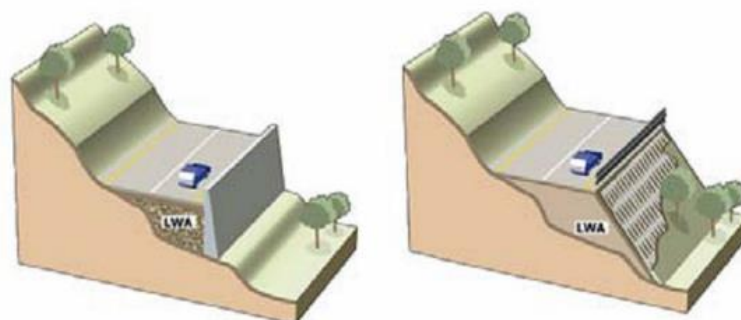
A Schematic Plan of Application of LECA on Lightweight Embankment on Slopes [13].
